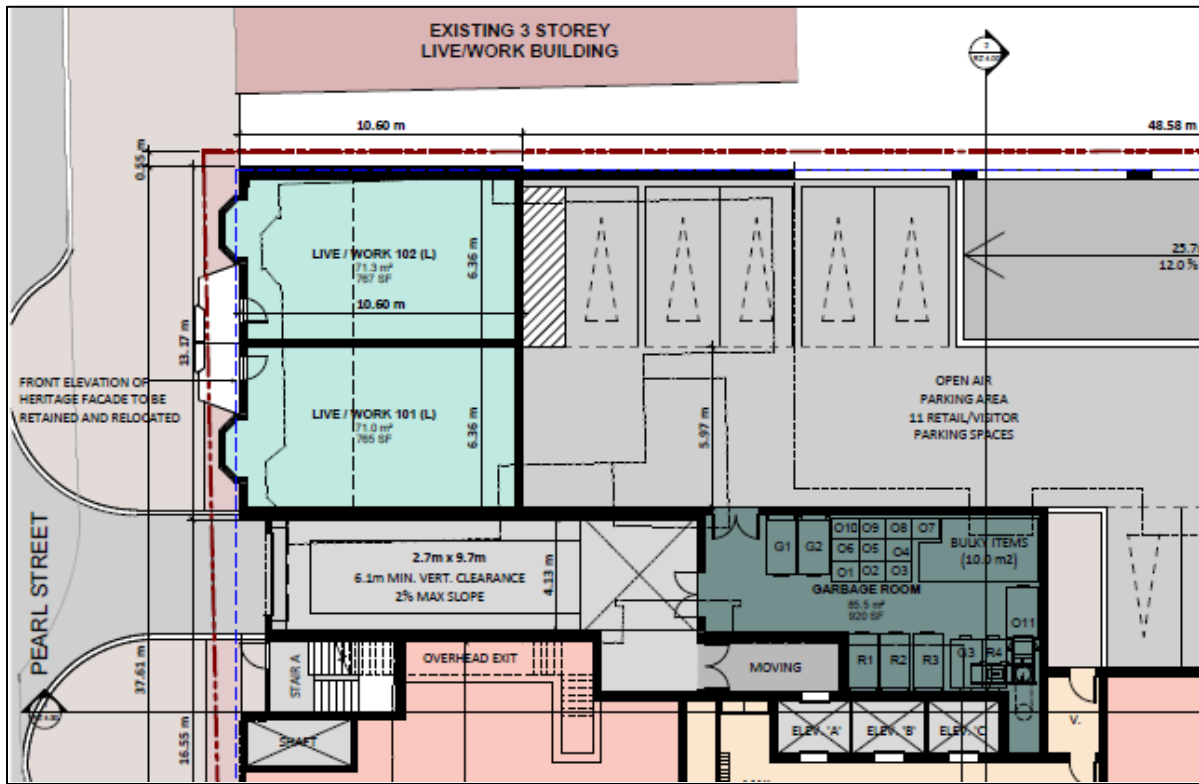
Excerpt from Floor One plan (source: TurnerFleischer Architects)
